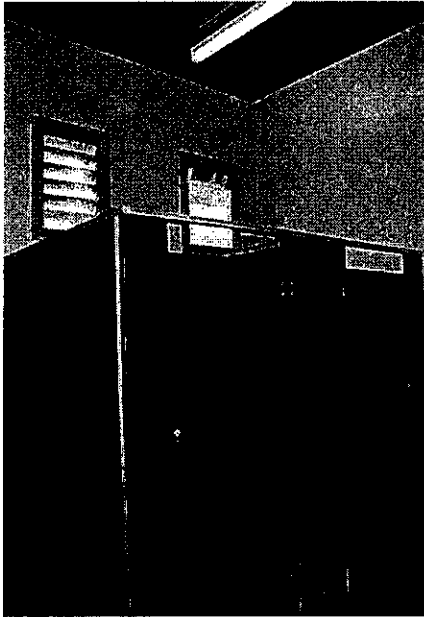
Interior, Ladies' Toilets (space B08a). Detail of introduced toilet cubicles and windows (in the background).
